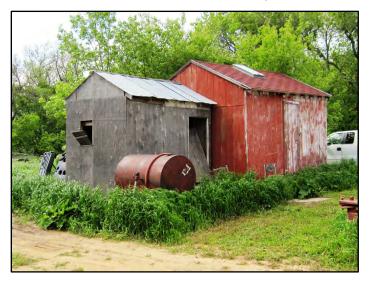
View to northwest of Building 3 east facades and south elevations.
